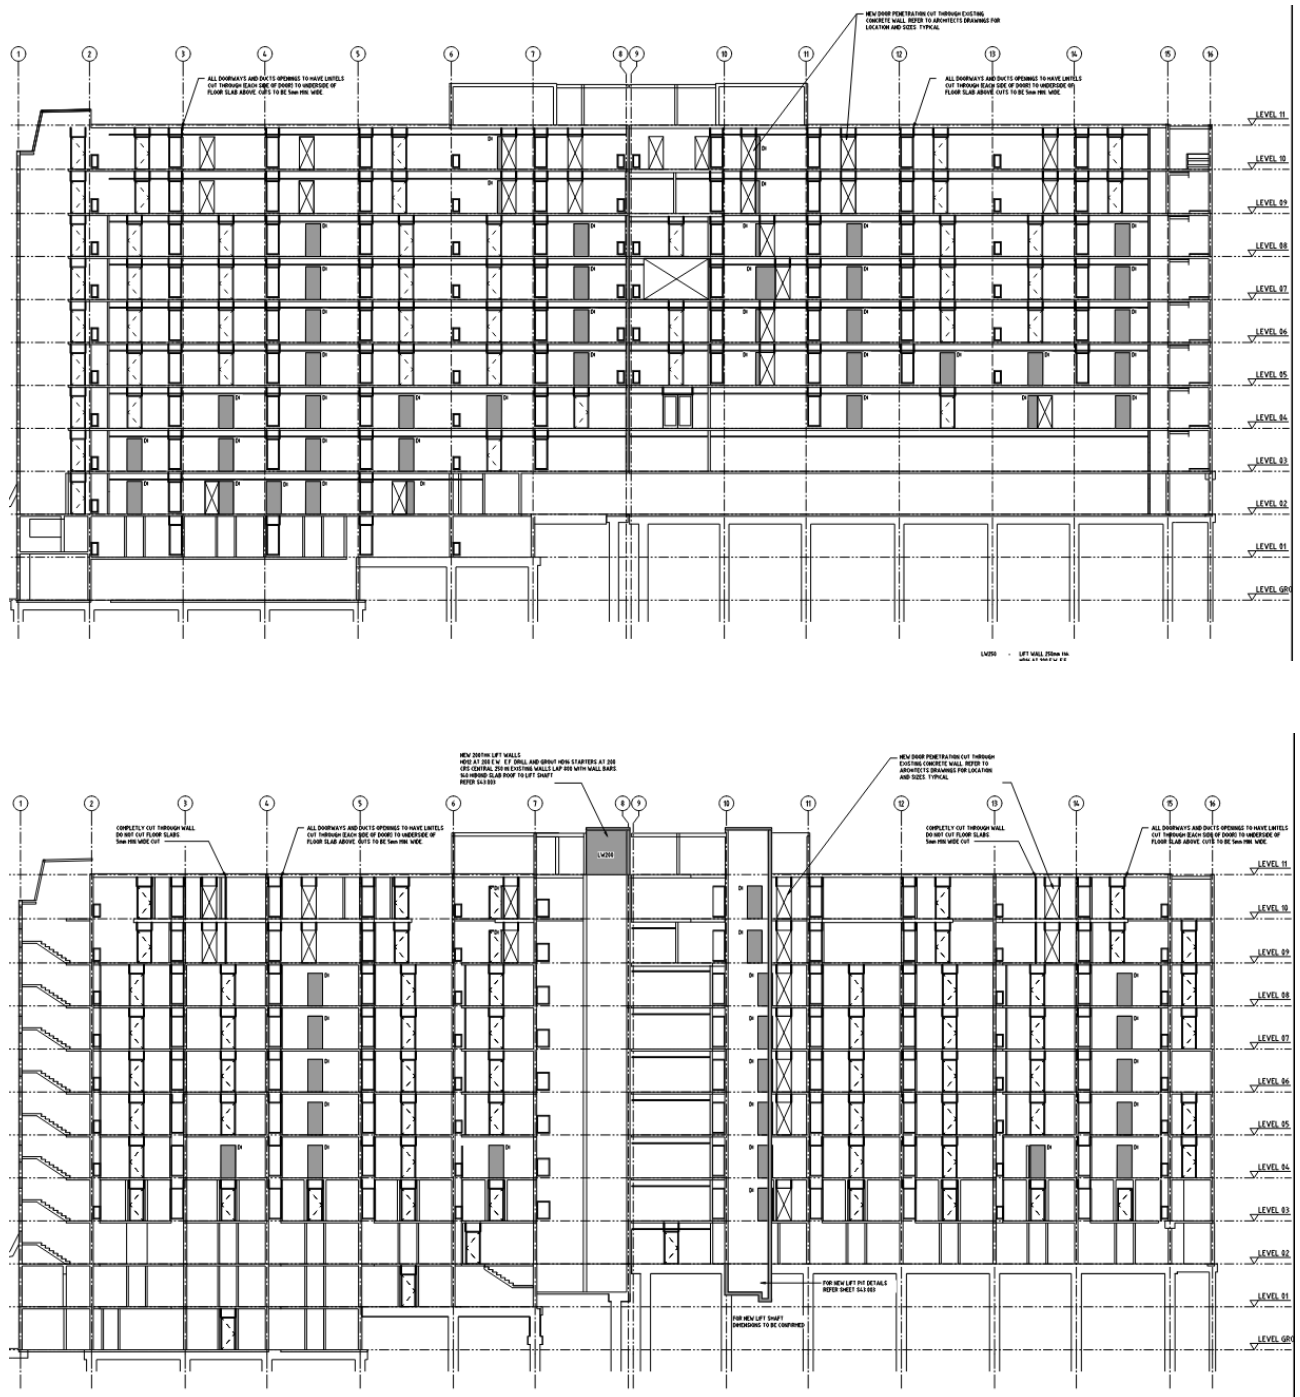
, Lateral Load Resisting Elements in the Longitudinal Direction
